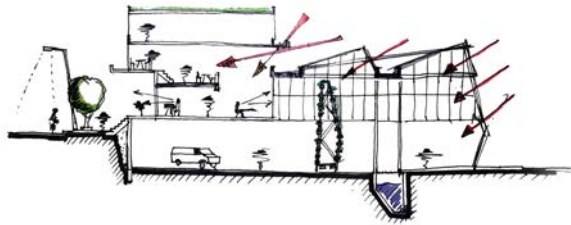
Greenhouse section sketch 2 (Author 2018)
